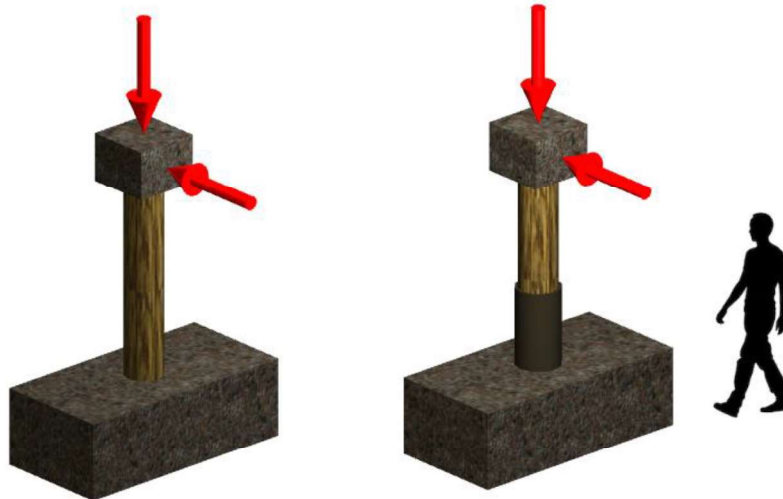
Test setup for large scale testing. (a) benchmark specimen for timber pile, (b) repaired timber pile with UHPC enhancement.
